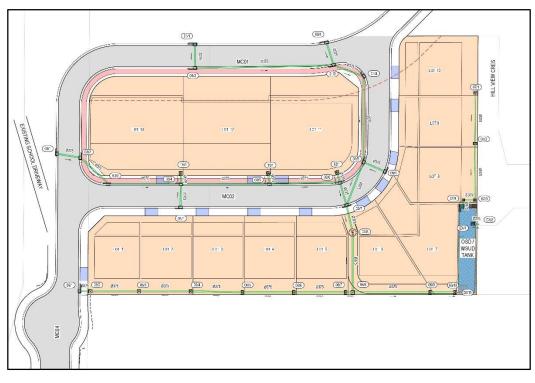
Subdivision layout plan (Extract from ACOR Consultants drawings)
